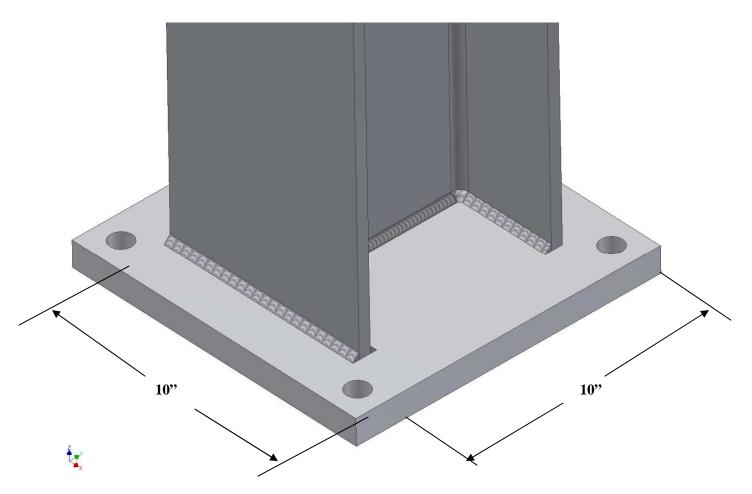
Base plate geometry. The column is has a 3/8" fillet weld all around. The plate is connected to the floor with 3/4" Hilti anchors.
